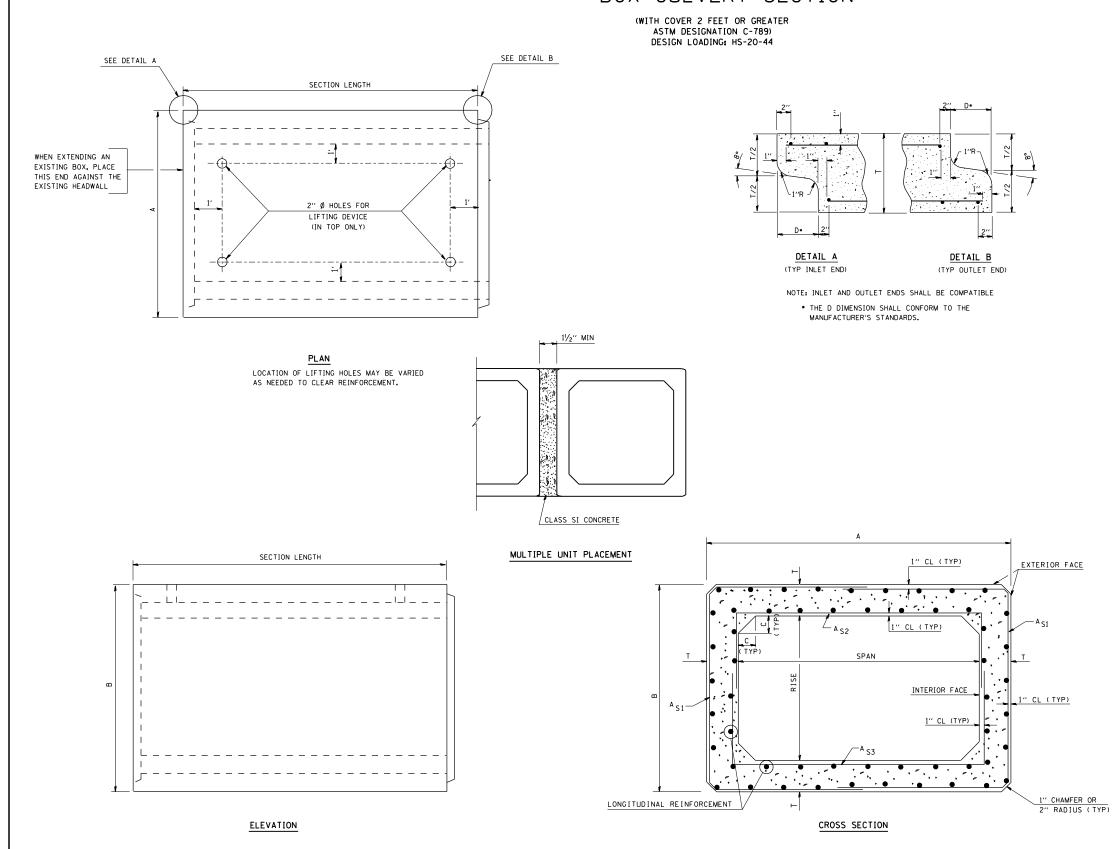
DETAIL OF PRECAST CONCRETE BOX CULVERT SECTION
